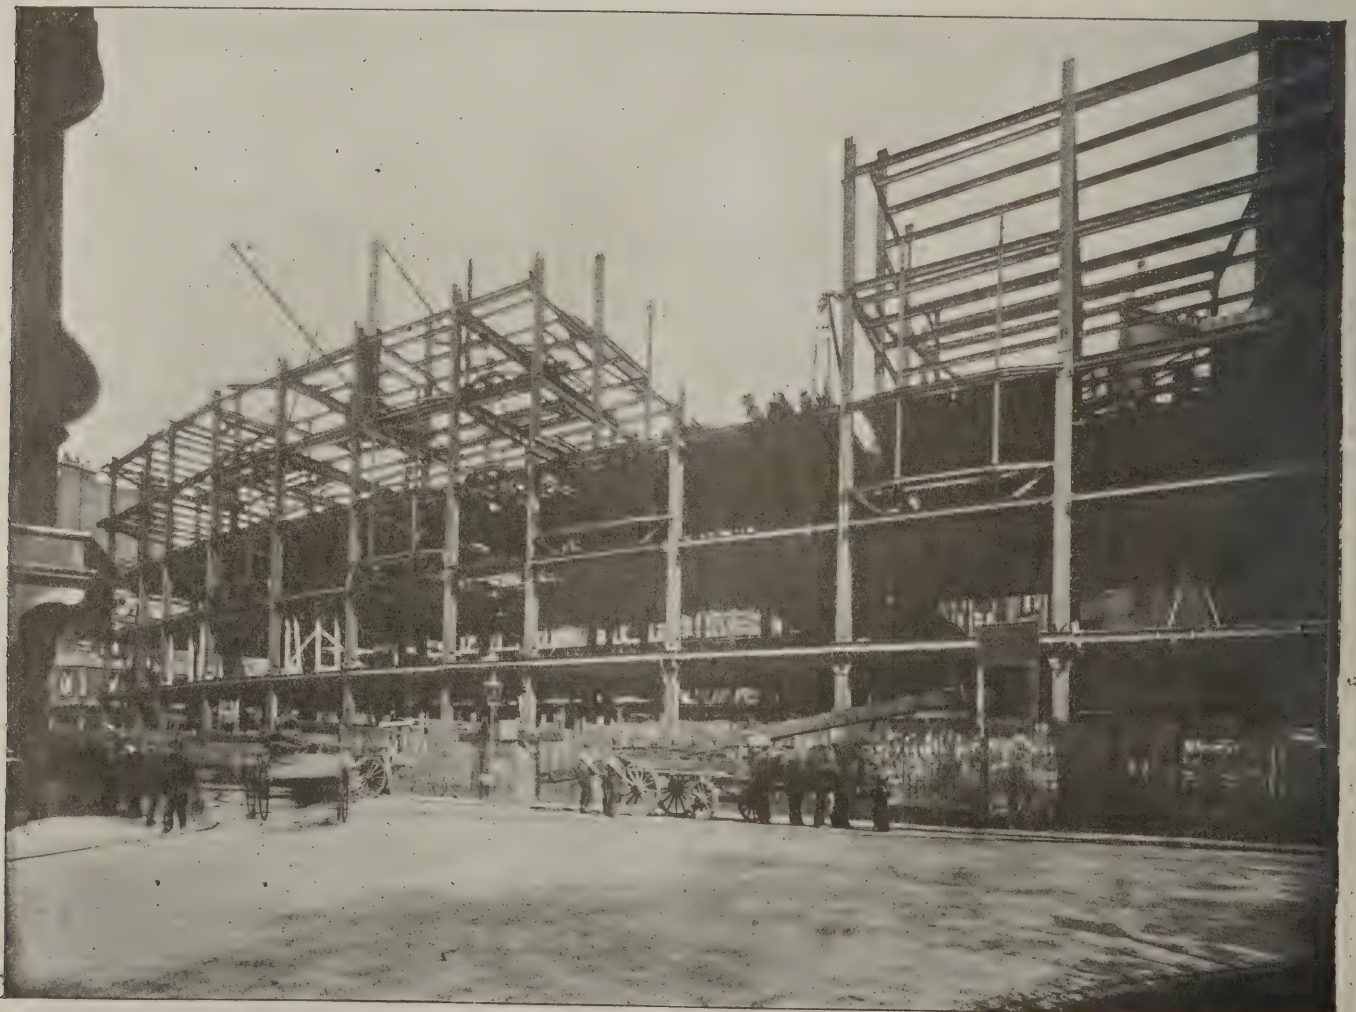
THE WESTMINSTER TRUST BUILDING, BROADWAY, WESTMINSTER.
